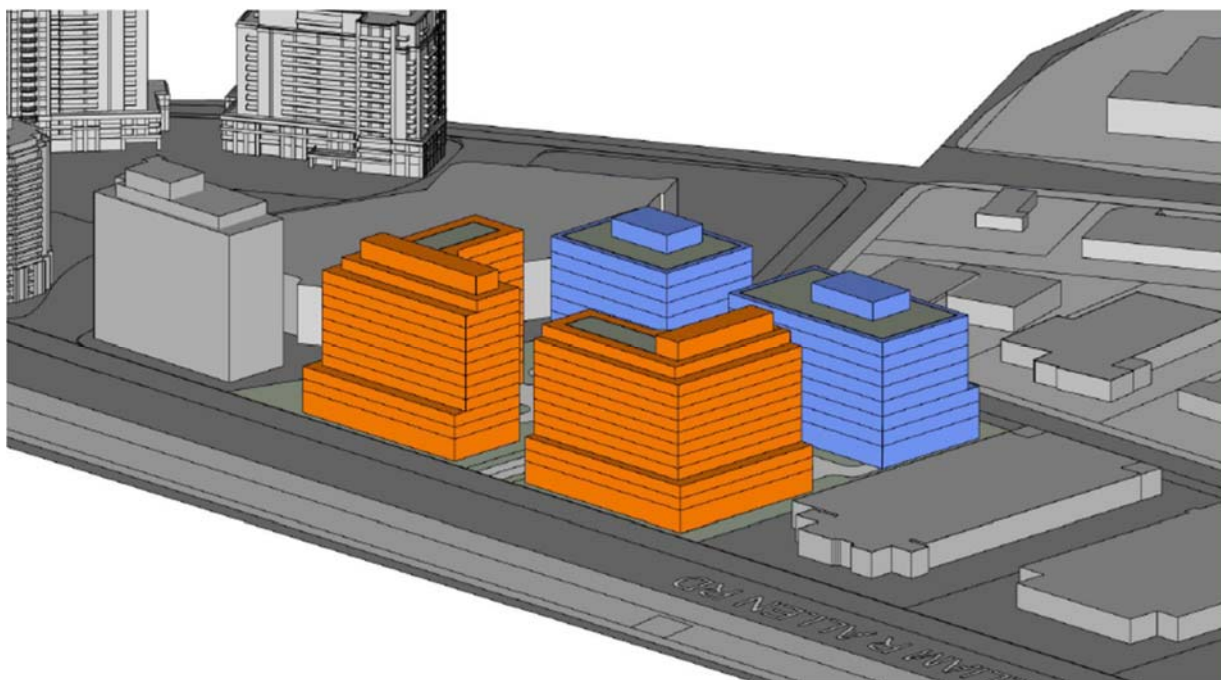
Conceptual Massing for Subject Lands (Mixed Use Buildings in Orange; Commercial Buildings (office/retail) in Blue)
